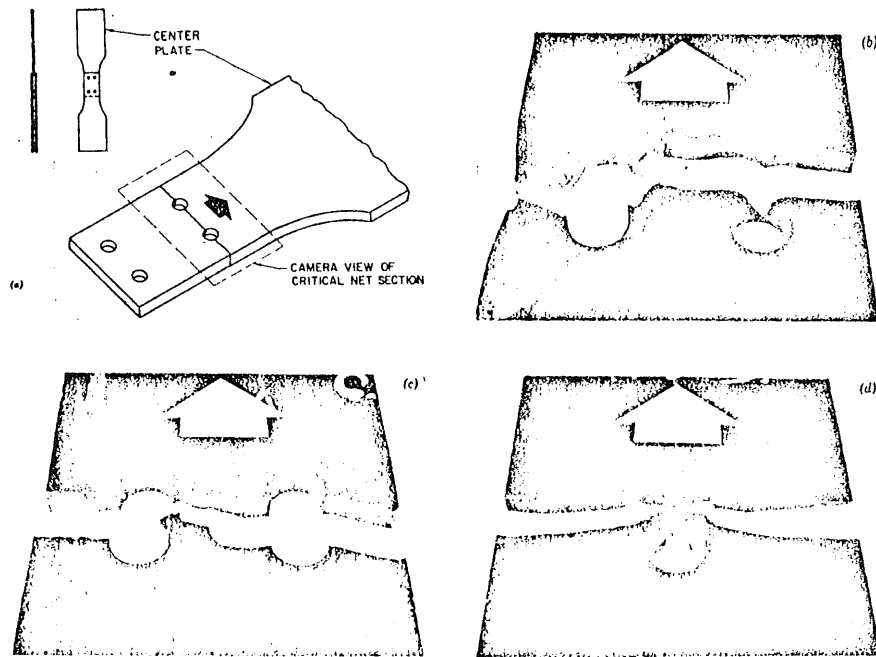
FATIGUE FRACTURES OF A440 STEEL IN BOLTED CONNECTIONS: (a) LOCATION OF FATIGUE CRACKS AND FRACTURES; (b) VIEW OF SPECIMEN L3B-7; (c) VIEW OF SPECIMEN L4B-5; (d) VIEW OF SPECIMEN L4BX-9
